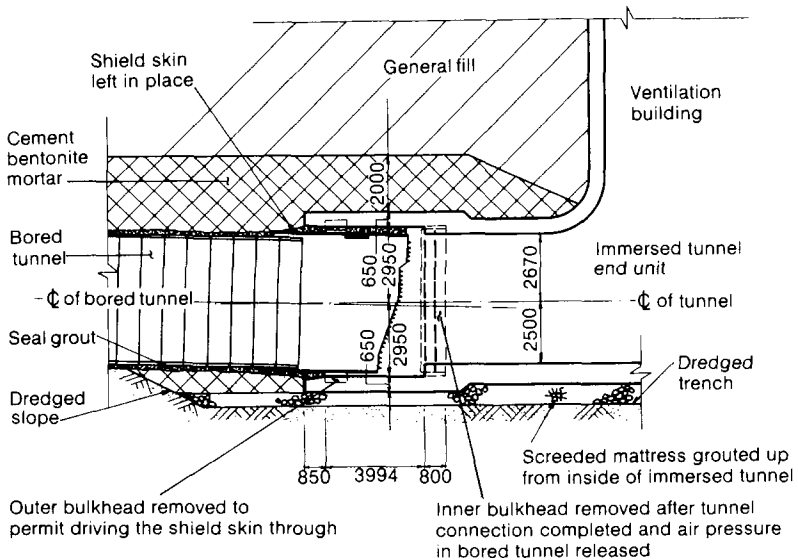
Connection of immersed tube to bored tunnel (dimensions in millimetres)
